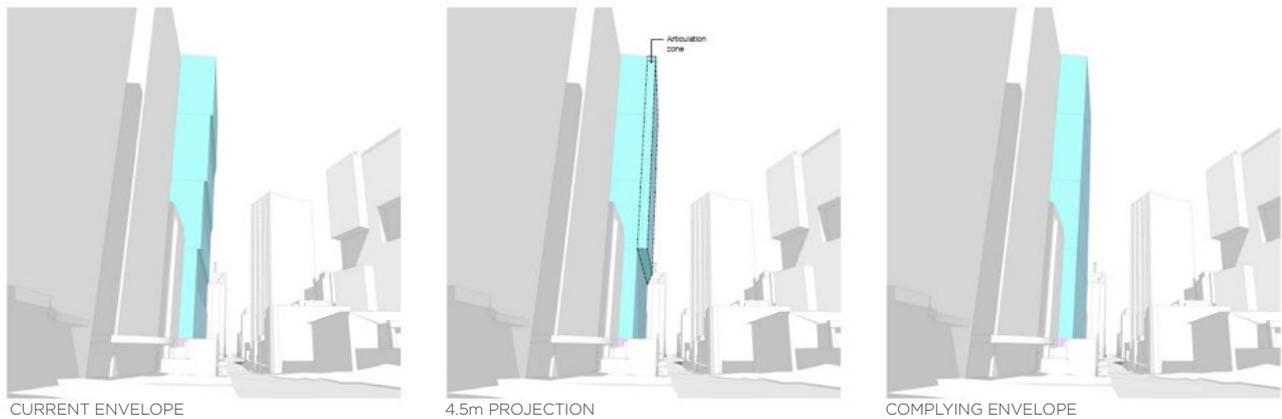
View of building envelope from the eastern side of Miller Street looking south (view location north of Berry Street)
